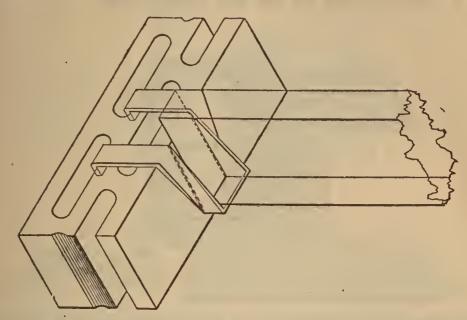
Use of Joist Hanger with Concrete Blocks.
